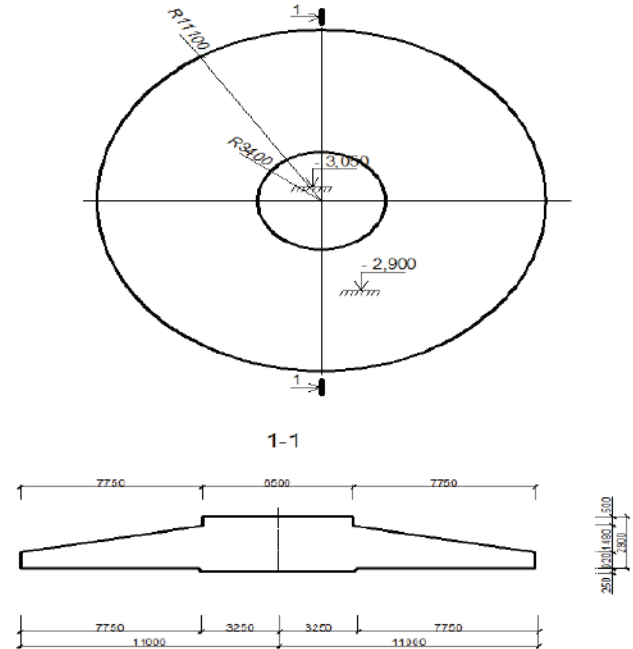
Dimensions and cross-section of typical foundation slab. (Zhussupbekovet al., 2016)
